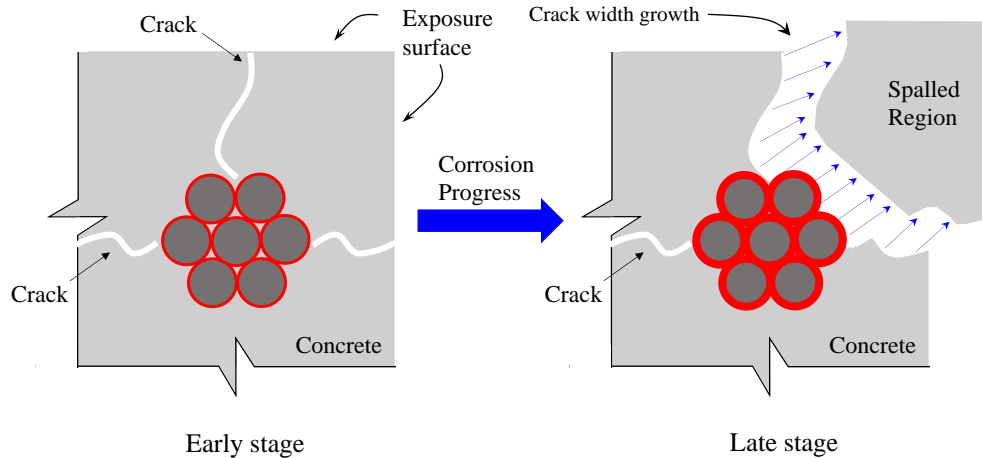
Corrosion-induced spalling of the concrete near the cross-sectional corner region.
